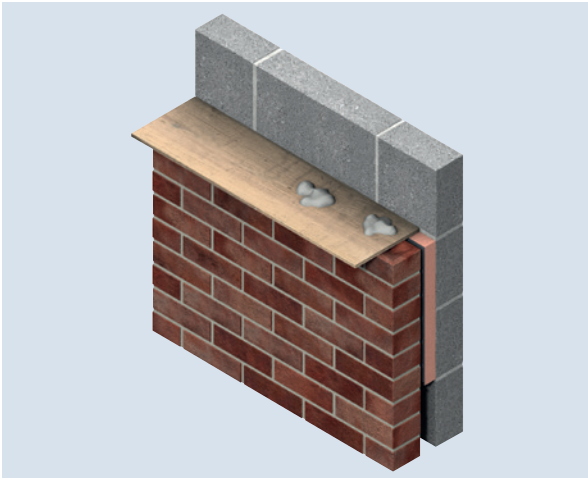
Use of a Cavity Board to Protect the Cavity and Insulation Board Top Edge
